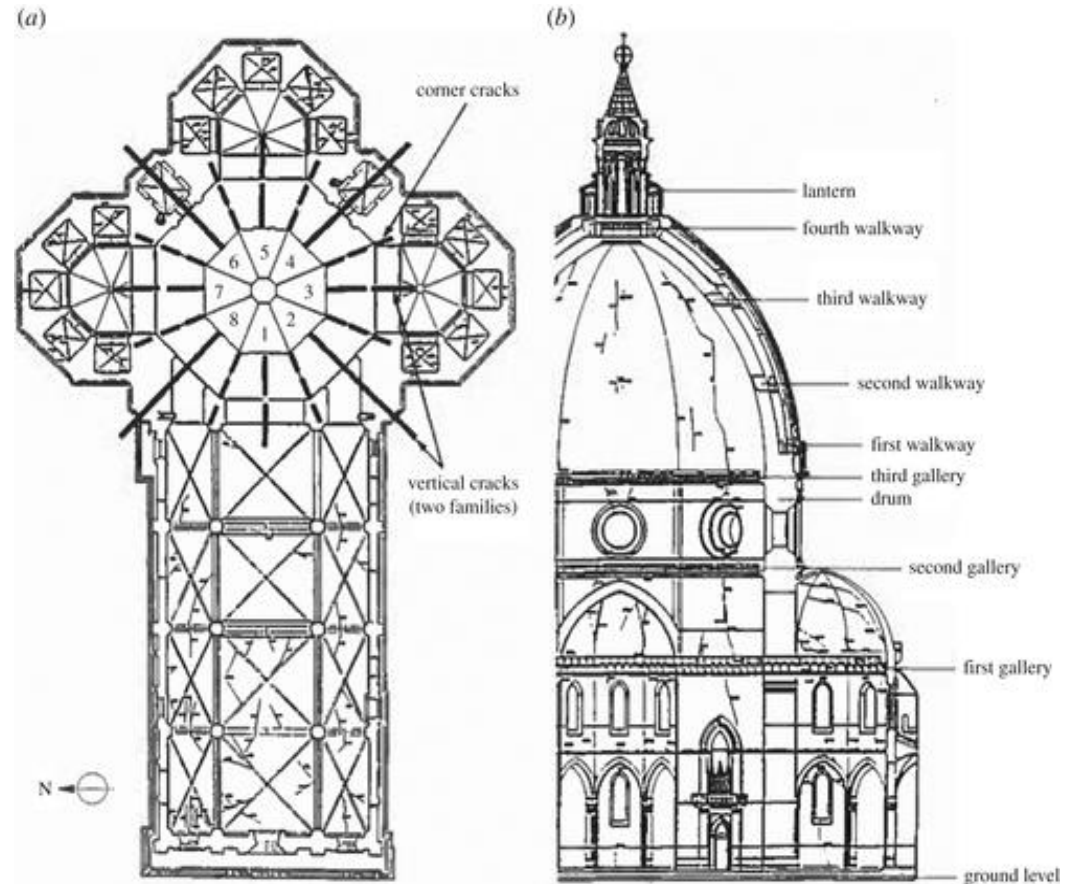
Plan (a) and cross-section (b) of Santa Maria del Fiore showing the location of the main cracks.
